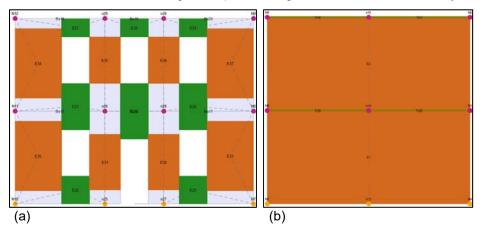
Numerical model of the selected building generated with 3-Muri© software: (a) discretization of the façade wall and (b) discretization of the lateral firewall.
